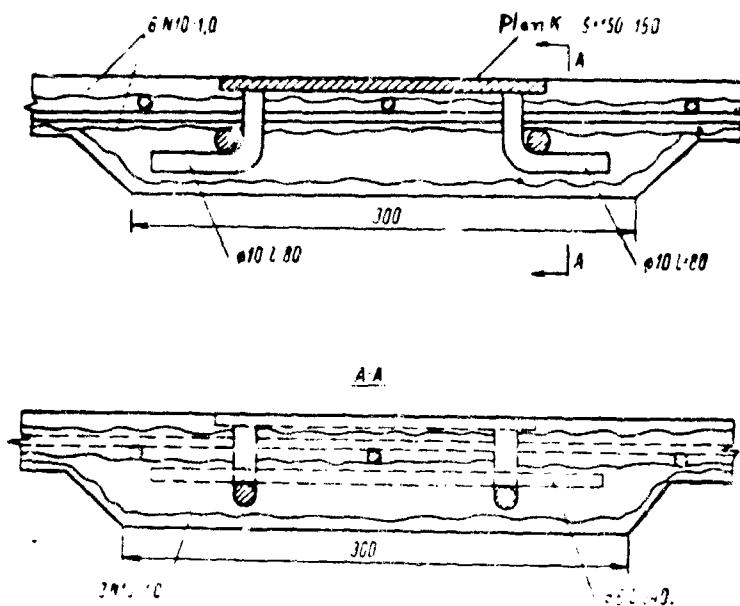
Attachment to Inserted Strips to the Reinforced Concrete Plates by Welding to the Anchoring Rods.
